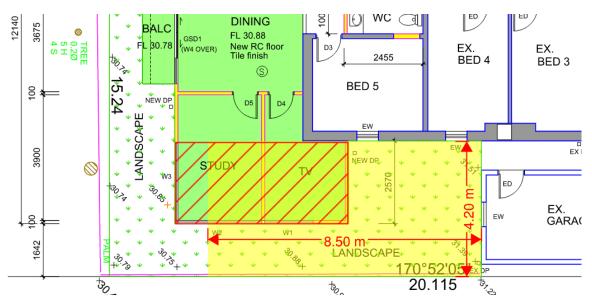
Markup of proposed ground floor plan – conditioned private open space area shown in yellow and deleted building footprint shown in red hatch (*Source: City Rhythm Pty Ltd with Council markup*)
